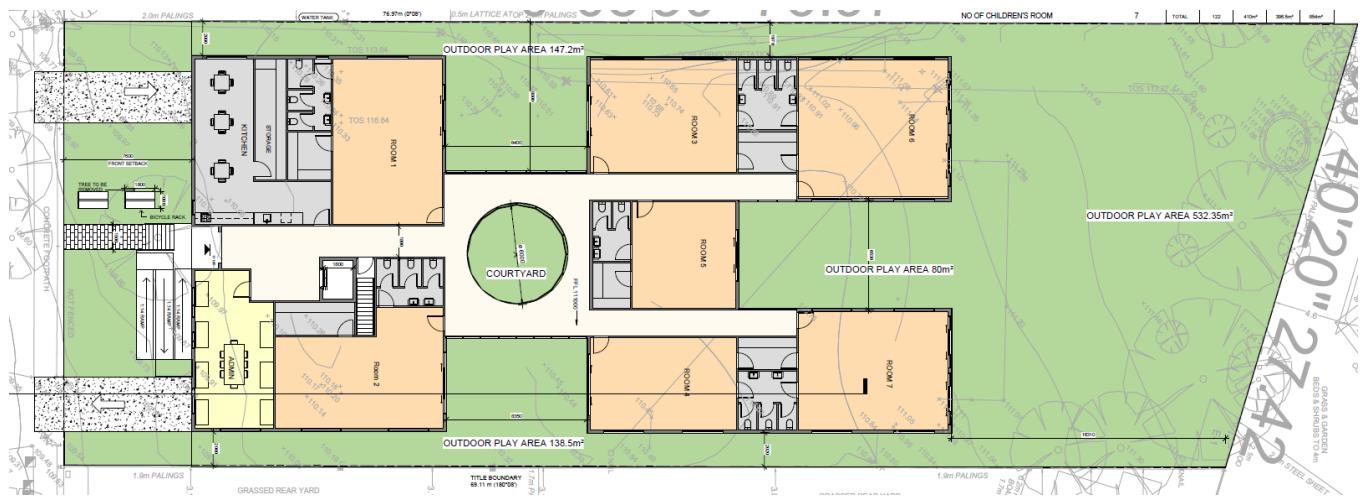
Proposed childcare centre (ADA Architects, 2023)
